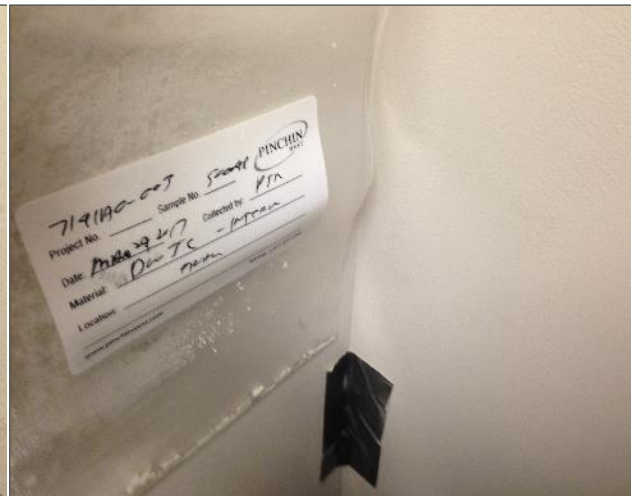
Drywall Joint Compound on interior walls (Sample S0004A-C) Office Location 119
